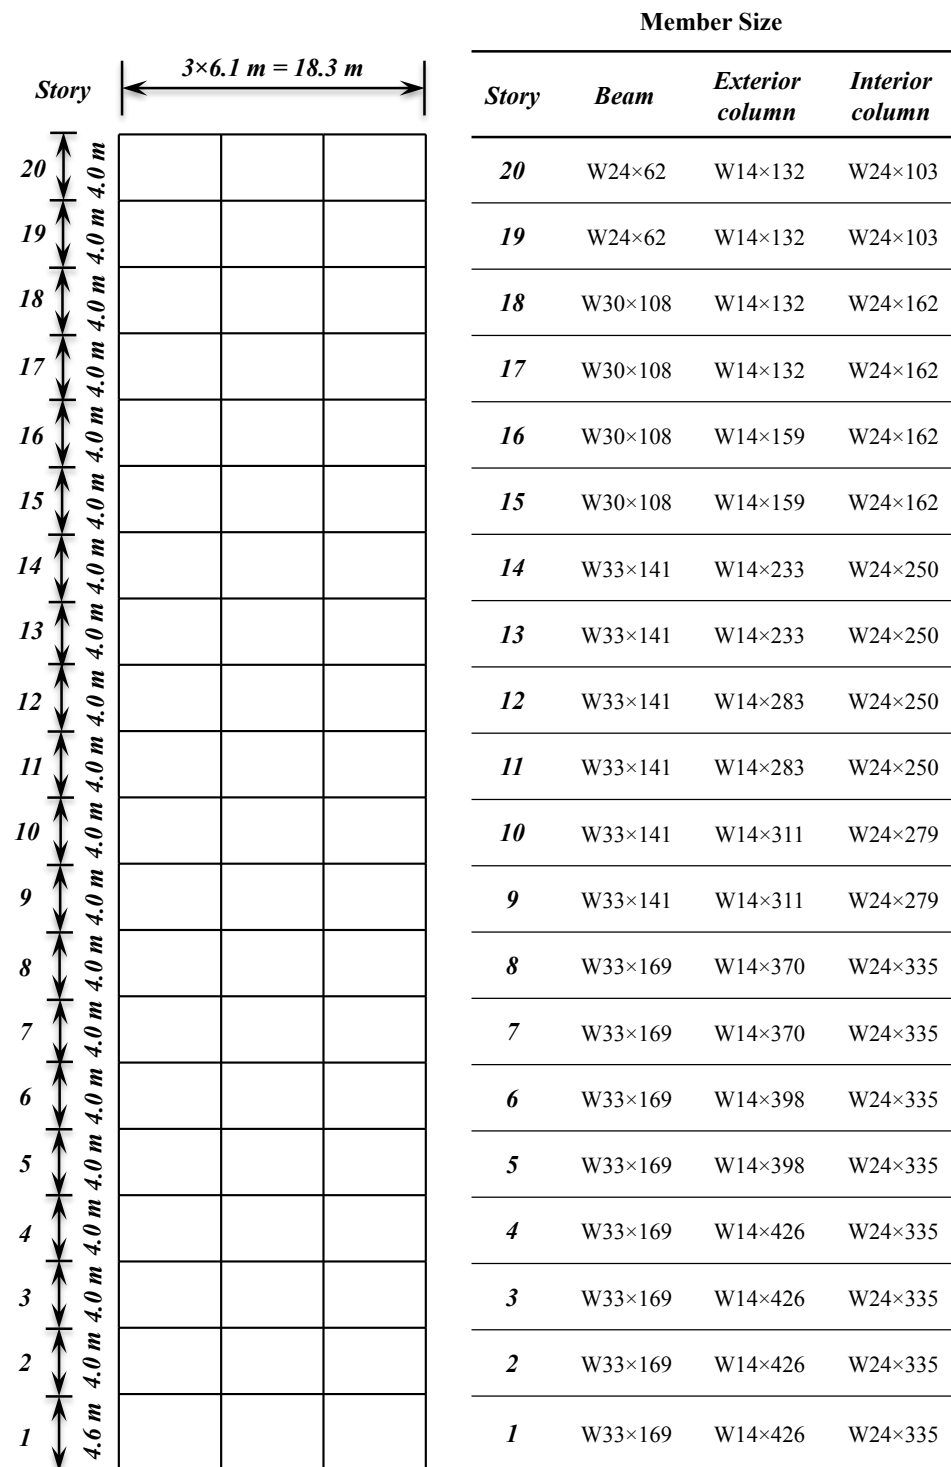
Elevation of building S-20 and the beam and column member sizes.
